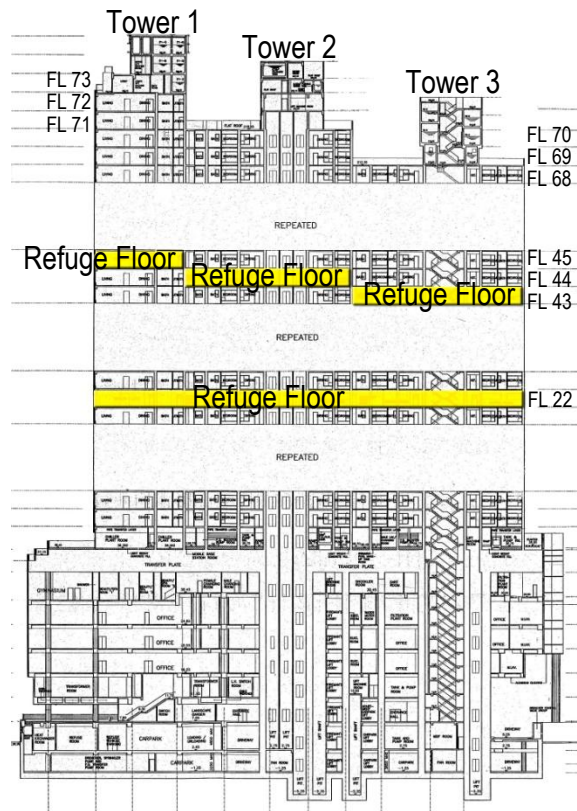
Section showing refuge floors (DLN Architects & Engineers 2001f)
